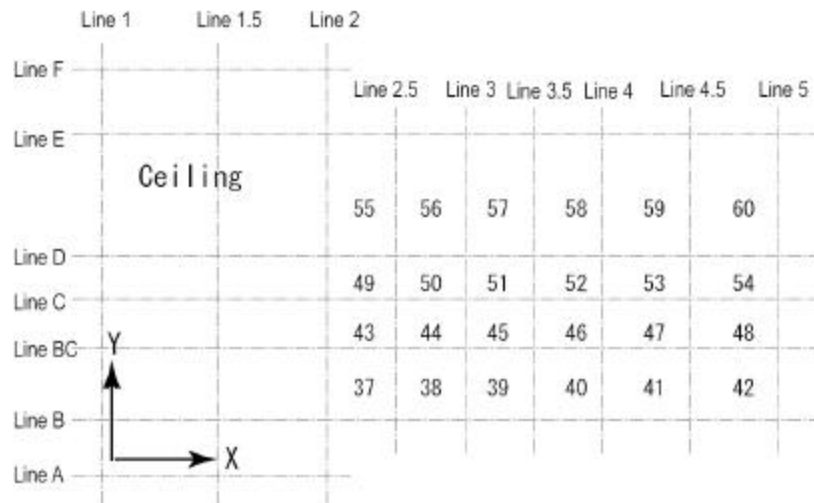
Locations, Orientation and Numbering of Quadrilateral Elements for the Ceiling of the Large-House Index Building.
